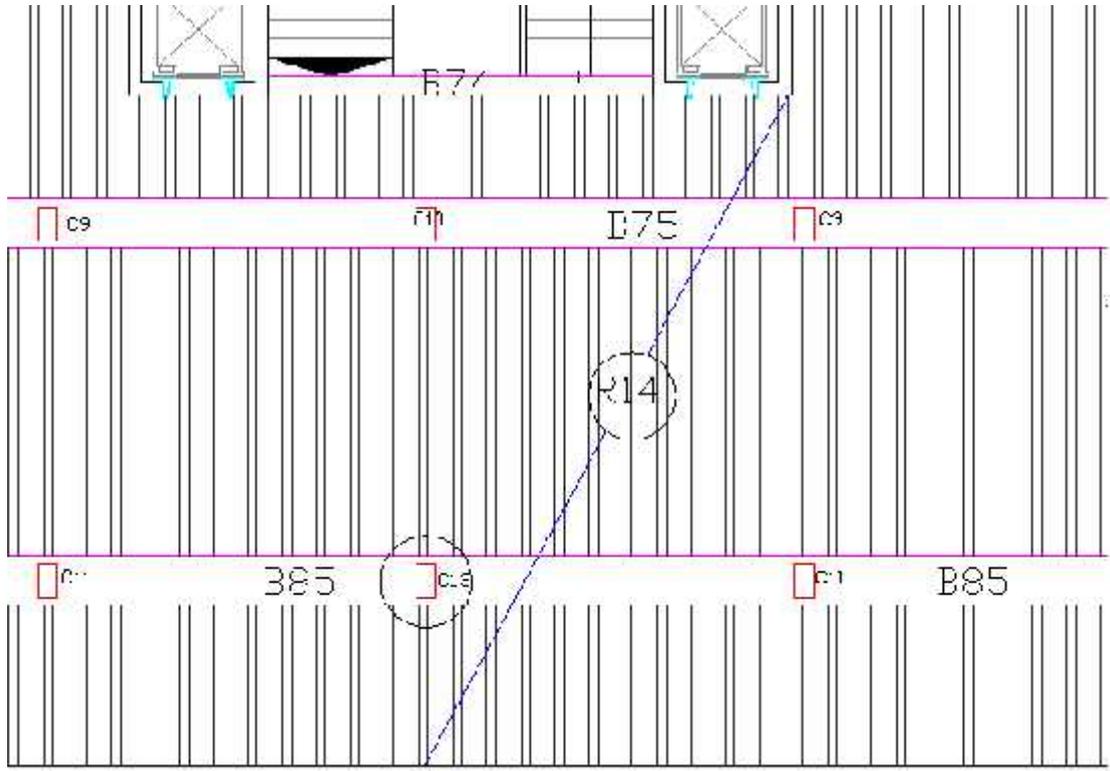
Place Of Column (C13) within the Ground floor.
